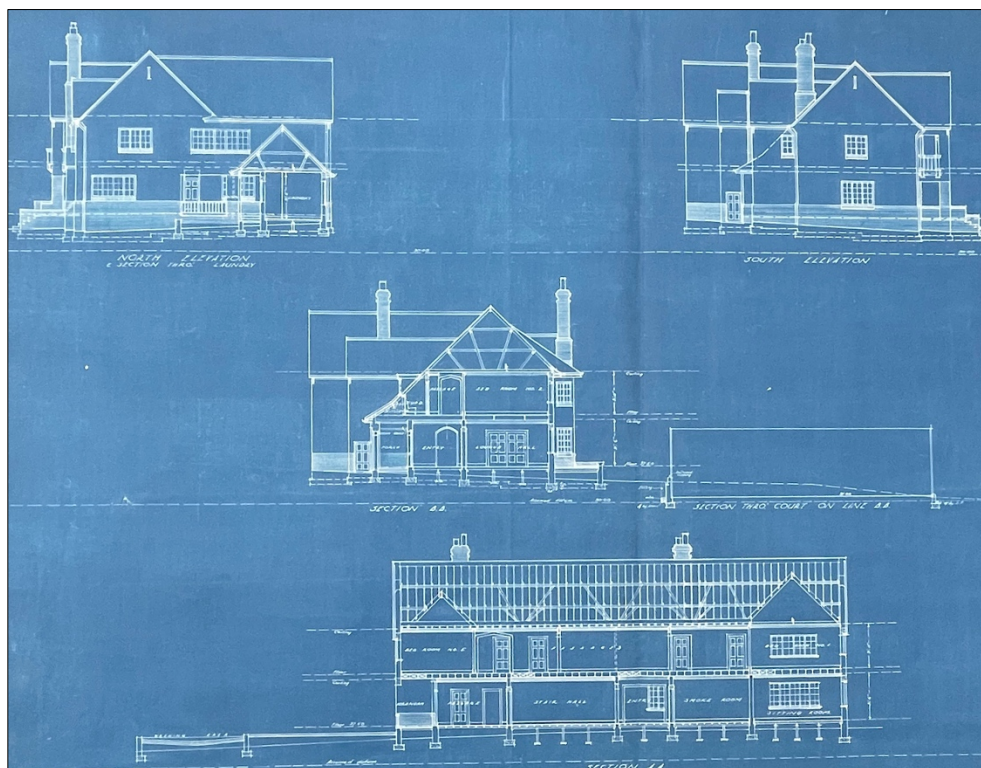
c.1926 North and south elevations, in addition to two cross sections of Little Milton. Source: Stonington History Centre
